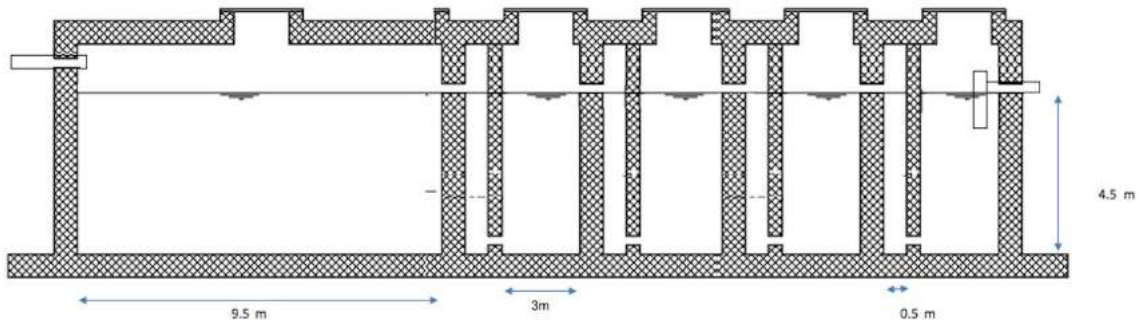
Longitudinal Cross Section of ABR with Inside Dimensions (Hydraulic Dimensions)
